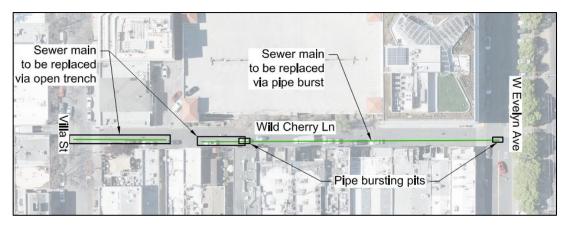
Wild Cherry Lane—Villa Street to West Evelyn Avenue
